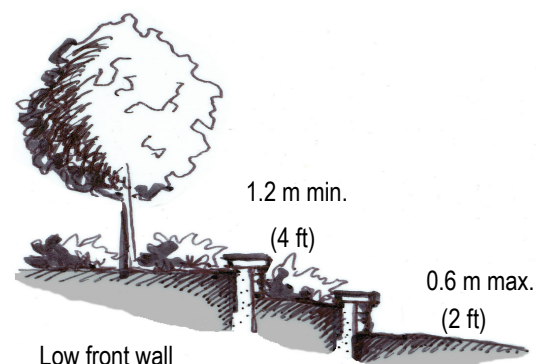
Grade Transition from sidewalk to front door —Thru terracing to minimize retaining walls.
